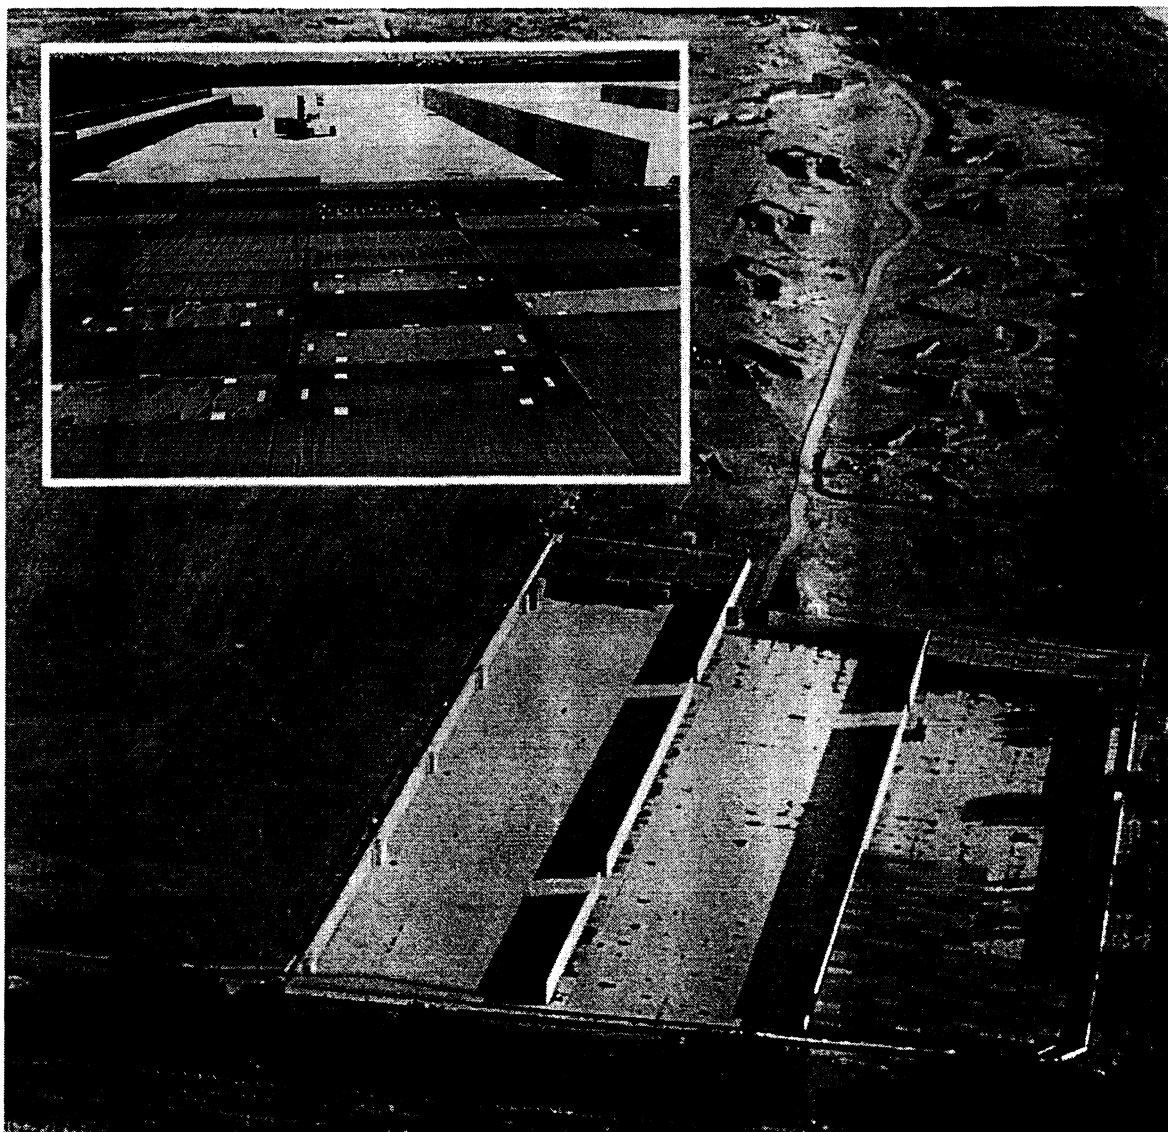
An aerial view of BNFL's low-level radioactive waste disposal facility at Drigg in north west England (CEC 1994). The bottom right-hand part of the main picture shows the concrete vault (known as Vault 8) which is divided into three sections by concrete walls. Super-compacted waste is loaded into steel ISO containers which are then filled with a fluid cement grout. Waste containers can be seen partially filling each of the vault sections. The inset gives a more detailed view of the tops of emplaced waste containers within the vault, and the emplacement method using a conventional fork-lift.
